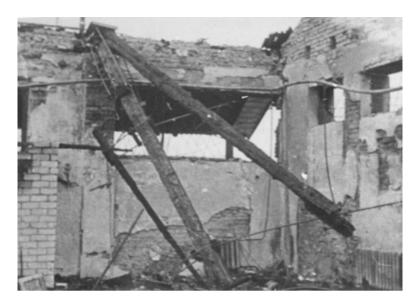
The collapse of wooden structures in a fire due to loss of strength of steel connections
